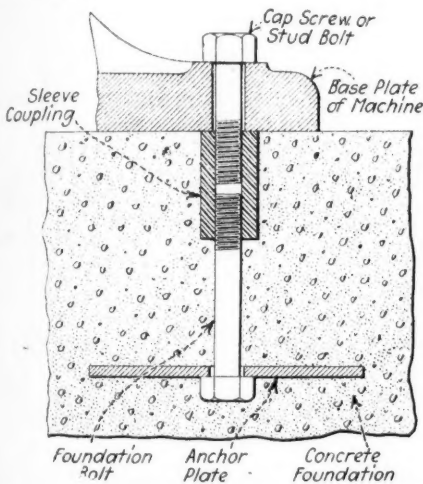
SLEEVE COUPLING PROVIDES PLACE FOR BOLT.
